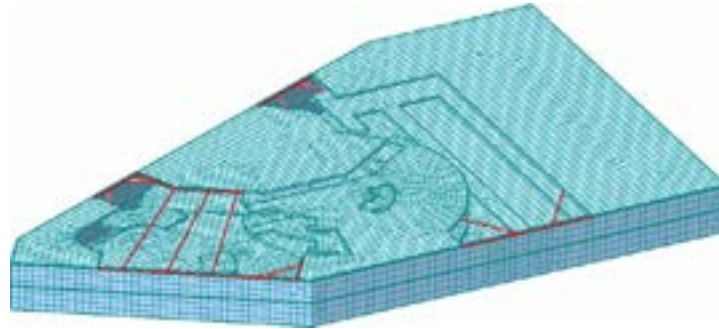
Propping and Waler Beam locations to Tower and Kingsway Building
